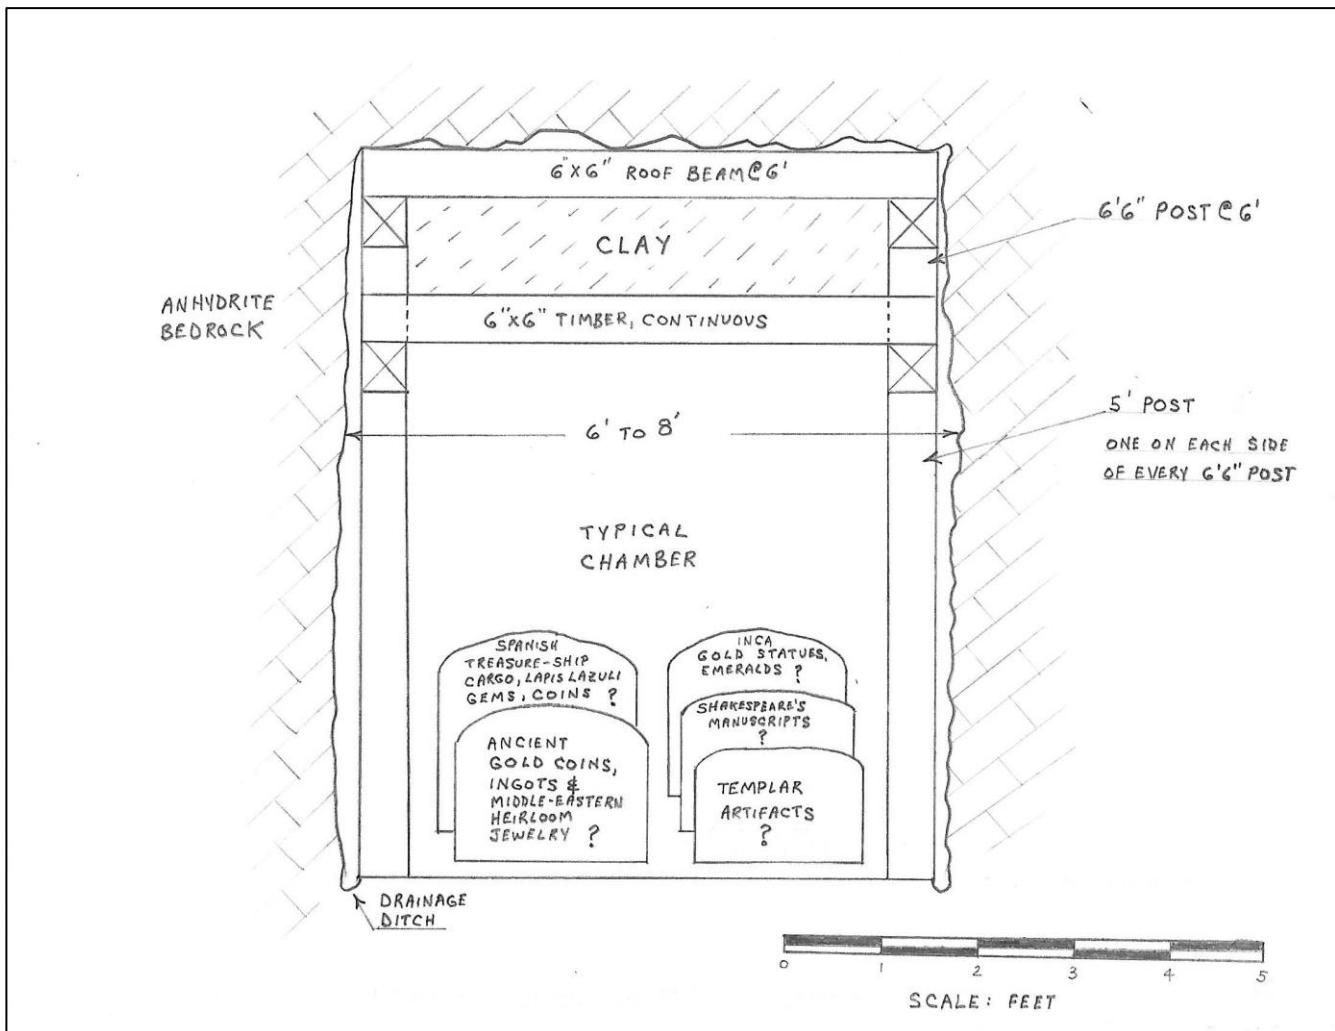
Authors' Concept of a Typical Cross Section through a Chamber
